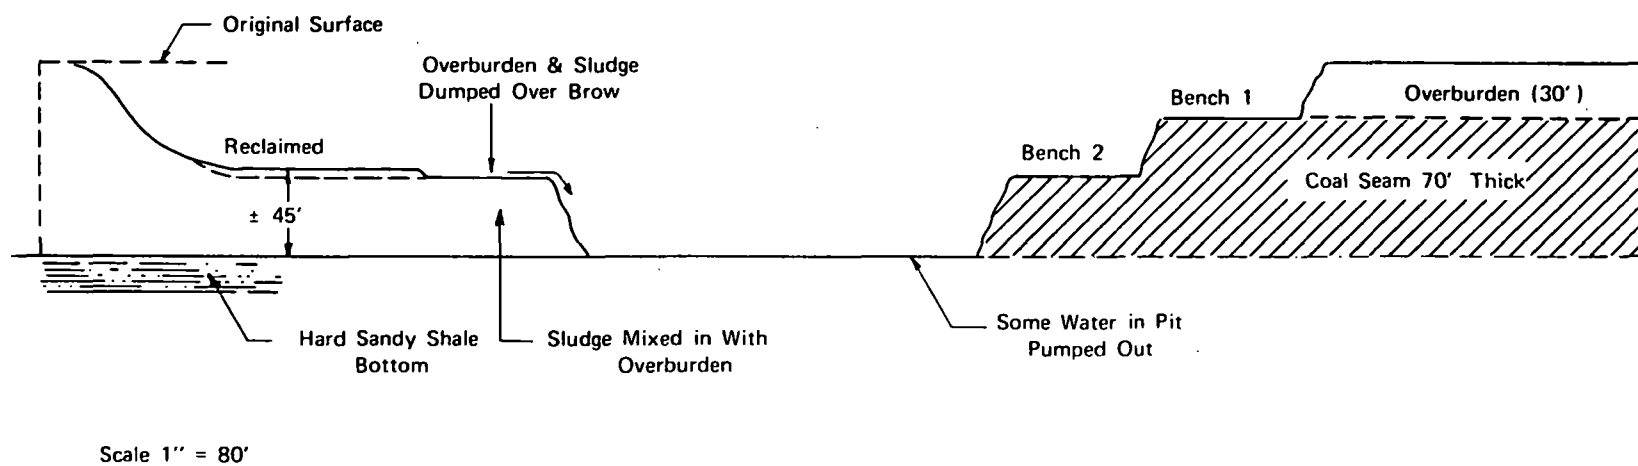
CROSS SECTION – WESTERN STRIP MINE
